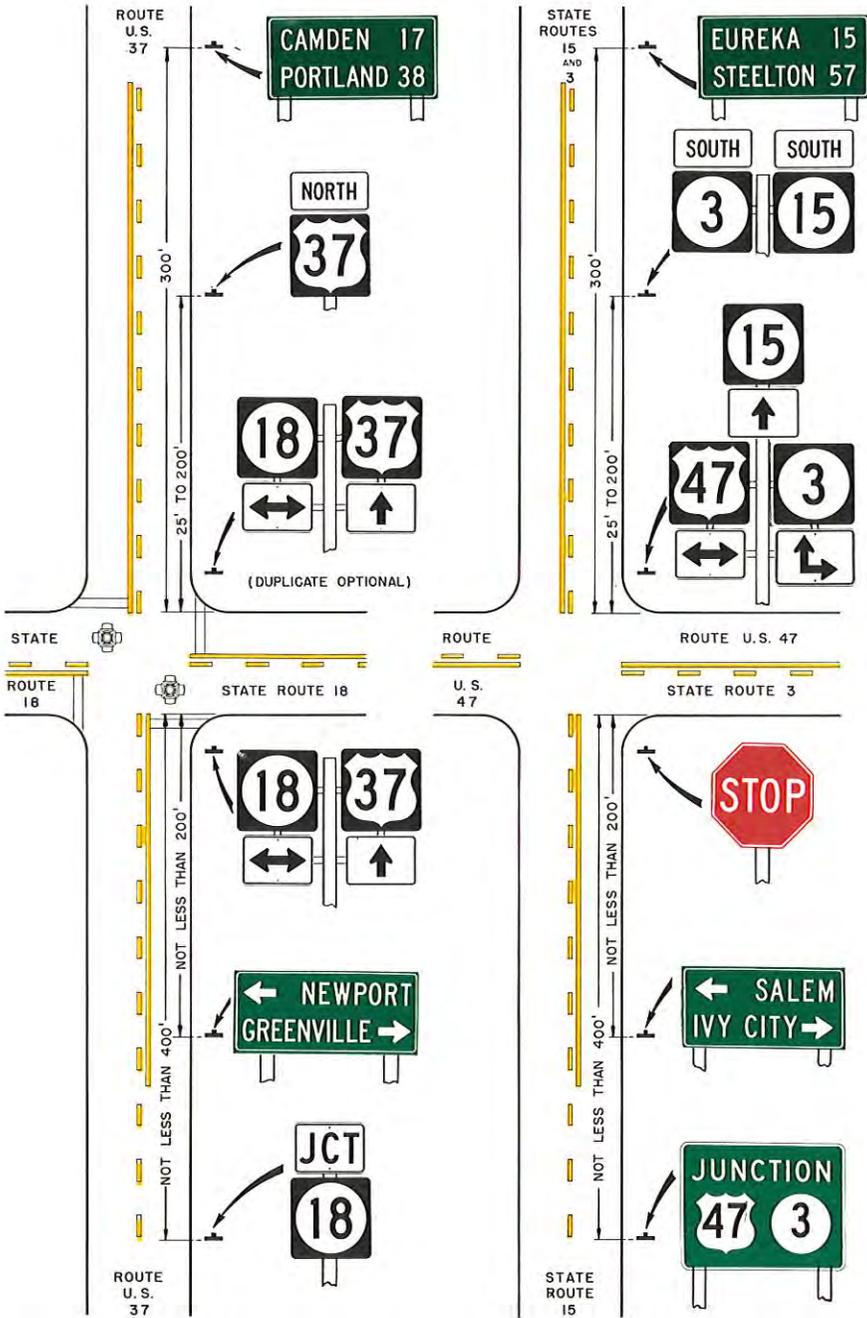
Typical route markings at rural intersections (for one direction of travel only).
